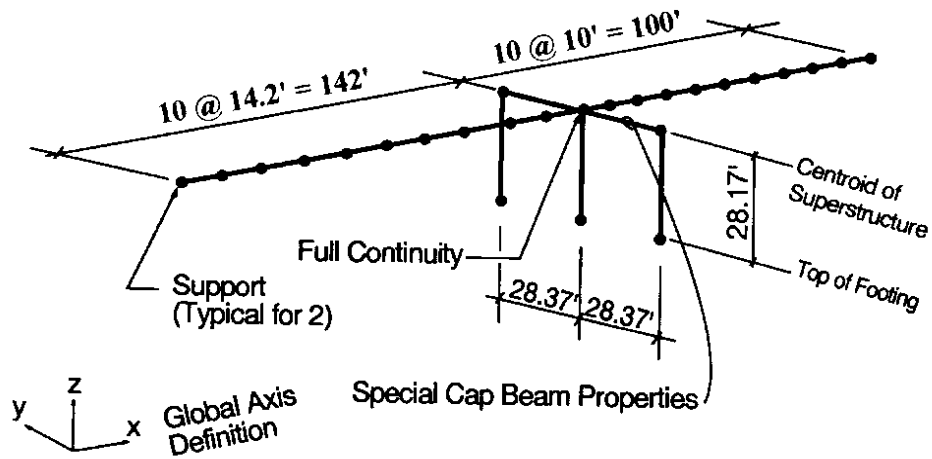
Computer Model of Bridge (adapted from Mast et al. 1996b).
